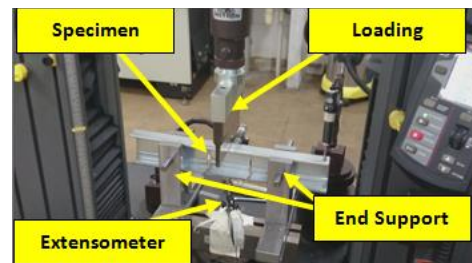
The flexural testing arrangement of the CFS channel section beam specimen.
